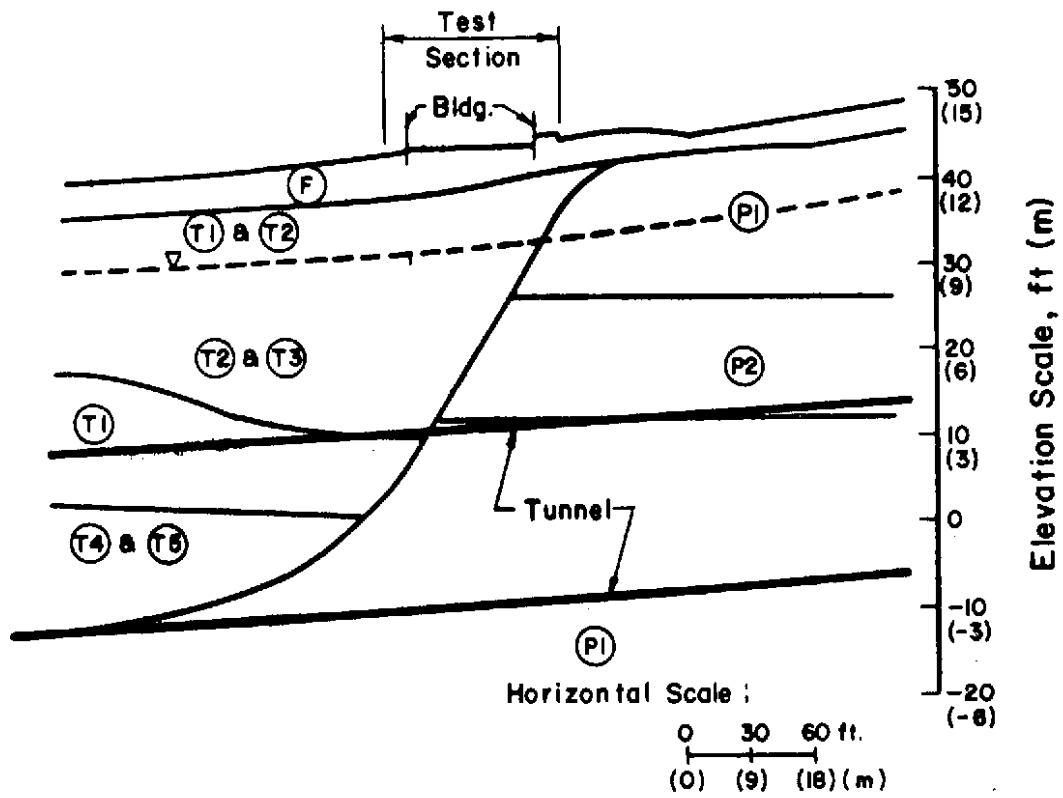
GEOLOGIC PROFILE AT SECTION G1 CROSS-SECTIONS
